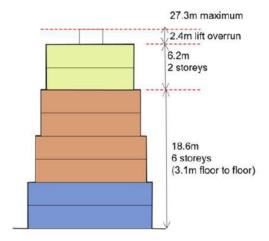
Indicative building envelope section with existing controls (blue), reforms (orange) and Housing SEPP AH bonus (yellow)
